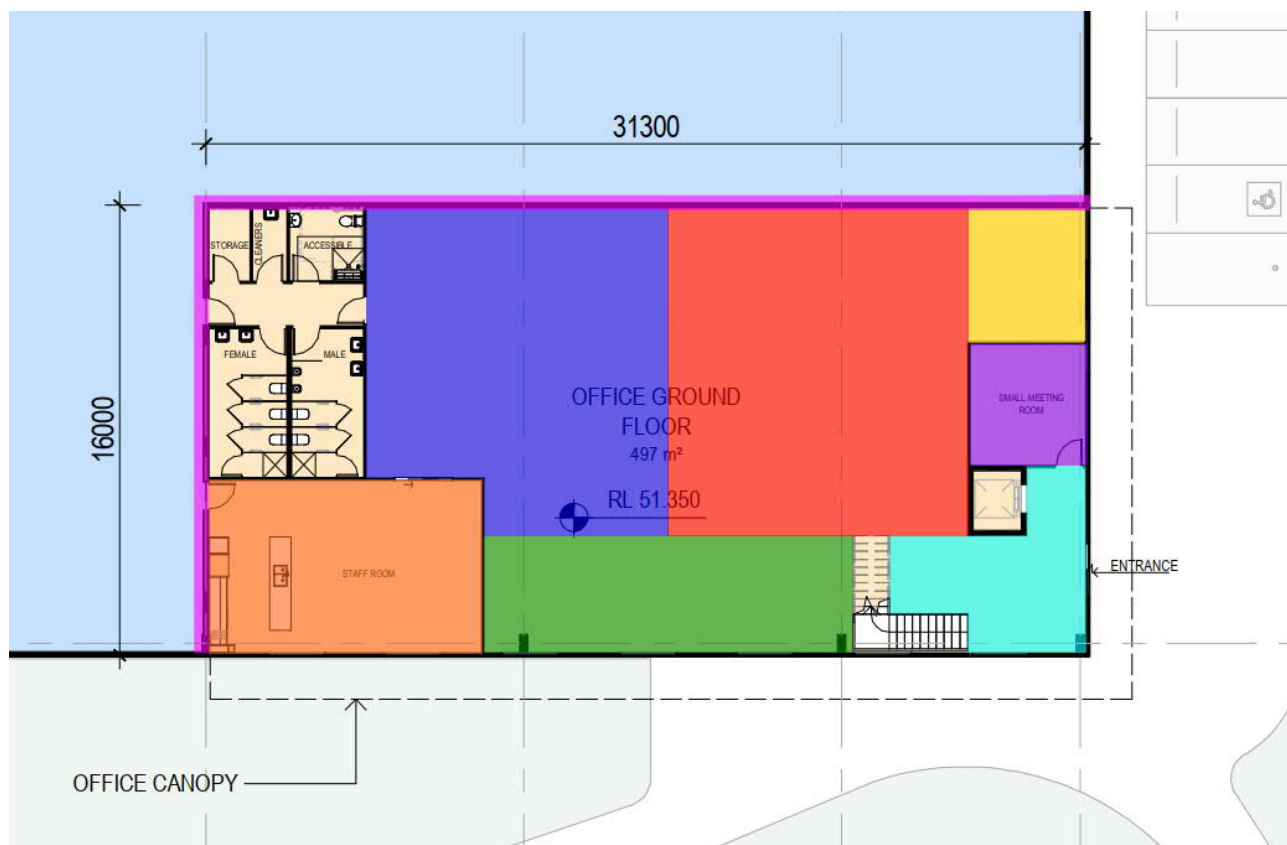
HVAC zones & thermal envelope for 8 Nursery Ave Ground Floor
